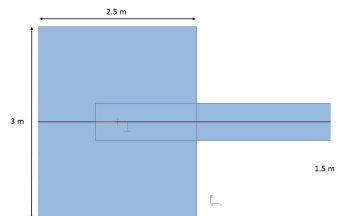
Connection between end abutment and concrete deck in SCIA
